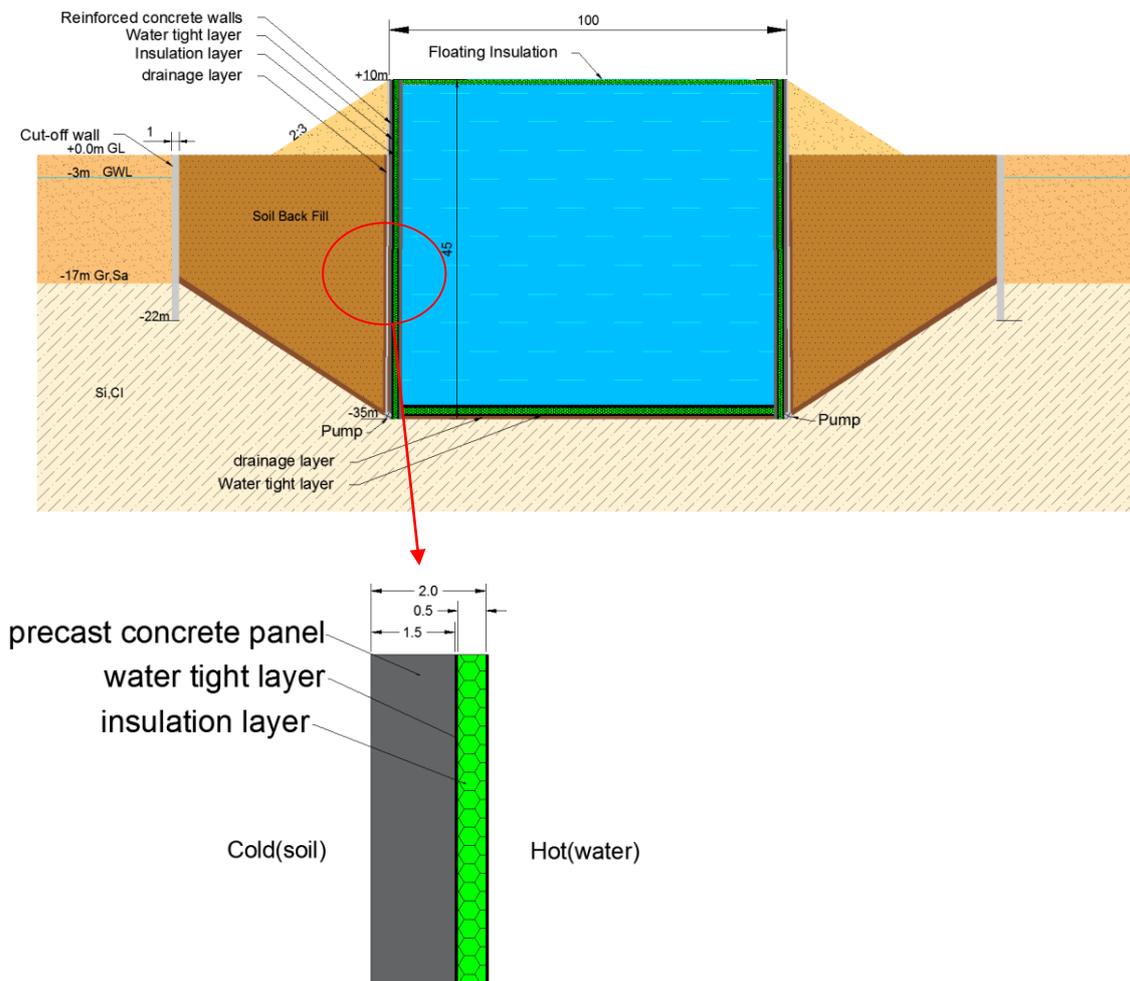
Cross section of Segmented Concrete wall with other layers in variant 7
